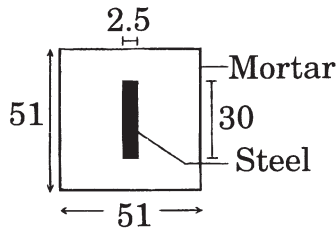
Specimen configuration for mortar with embedded steel plate. All dimensions are in millimeters.
